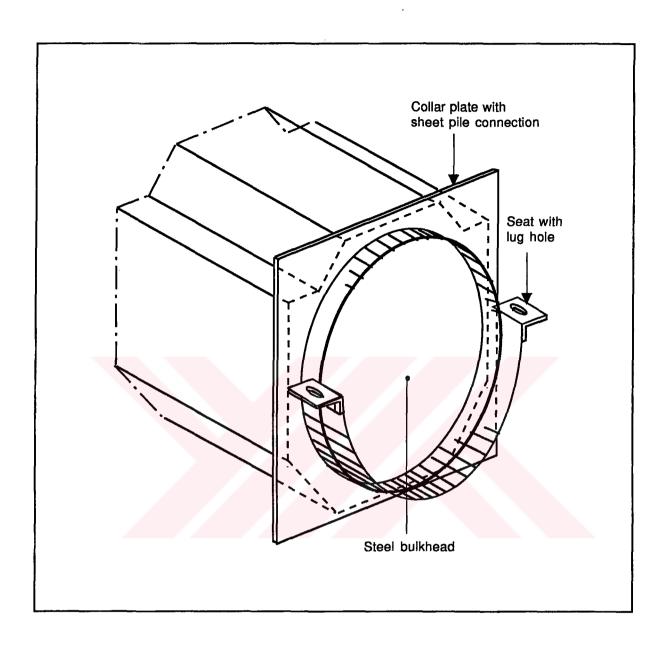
PERSPECTIVE VIEW OF JOINT CONNECTION
